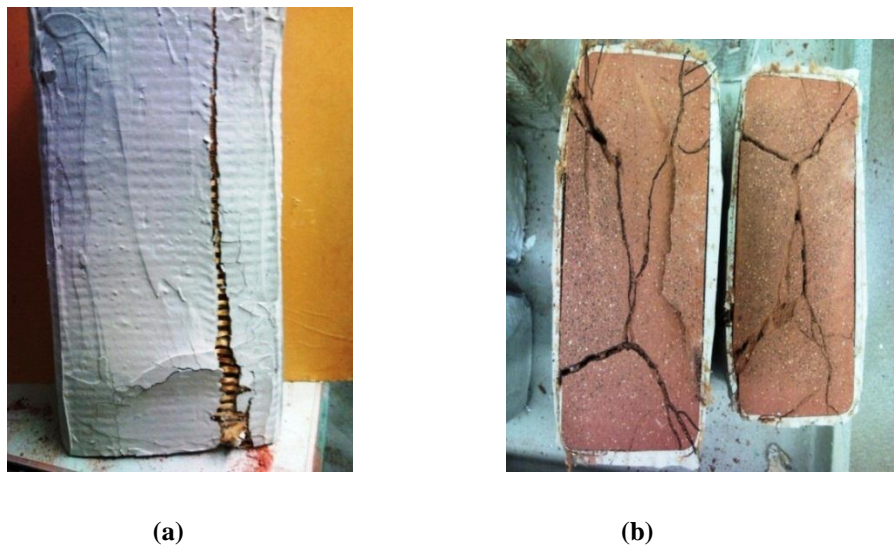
Photograph of (a) Elevation view of failed specimen; (b) Plan view of failed specimen cut at mid-height location
